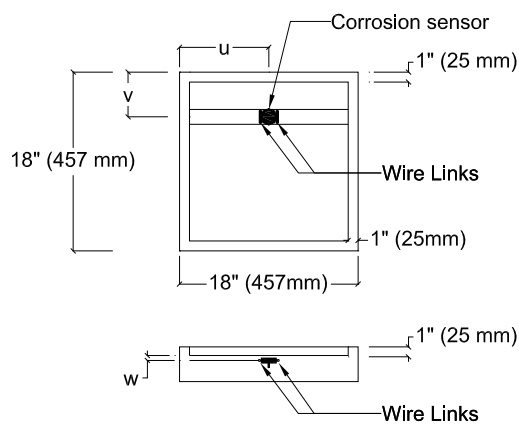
Detail of RFID Corrosion Sensor Installed in Ponding Test Specimens
